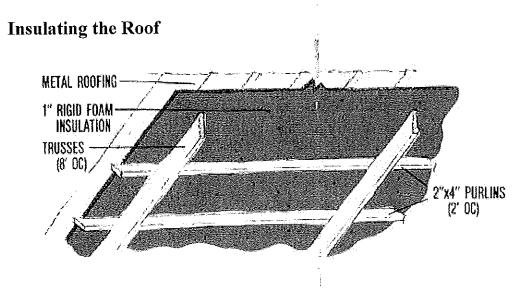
Rigid foam placed over purlins (R=4-9). Rigid foam placed over purlins is recommended for lightly-insulated livestock buildings and for machinery storage. The foam boards should be protected from moisture with tight-fitting tongue-and-groove joints. Screen building openings to keep birds away from the insulation. Foil faces and taped joints on top side reduce leaks.
